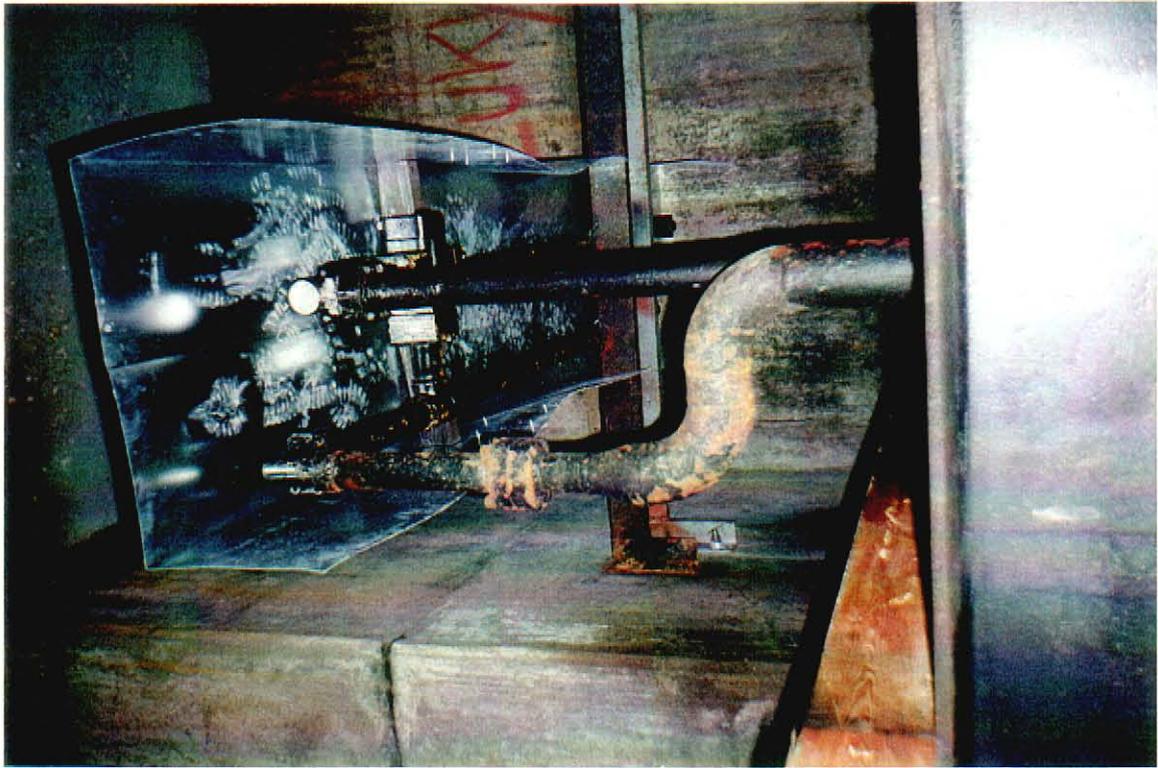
Hydraulic Piping Inside Mechanical Room
